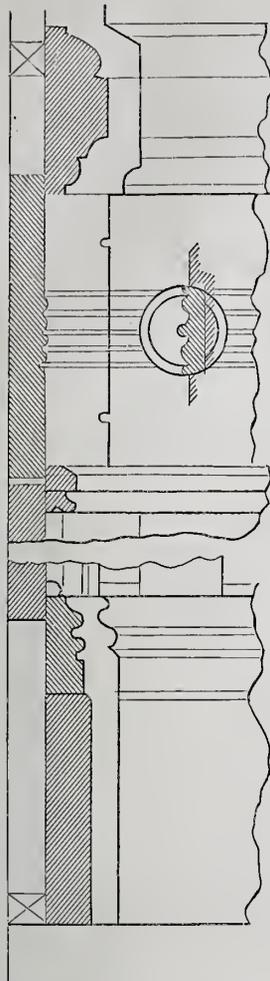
Details of Dado in Dining Room and Hall.—Scale, 3 Inches to the Foot.
